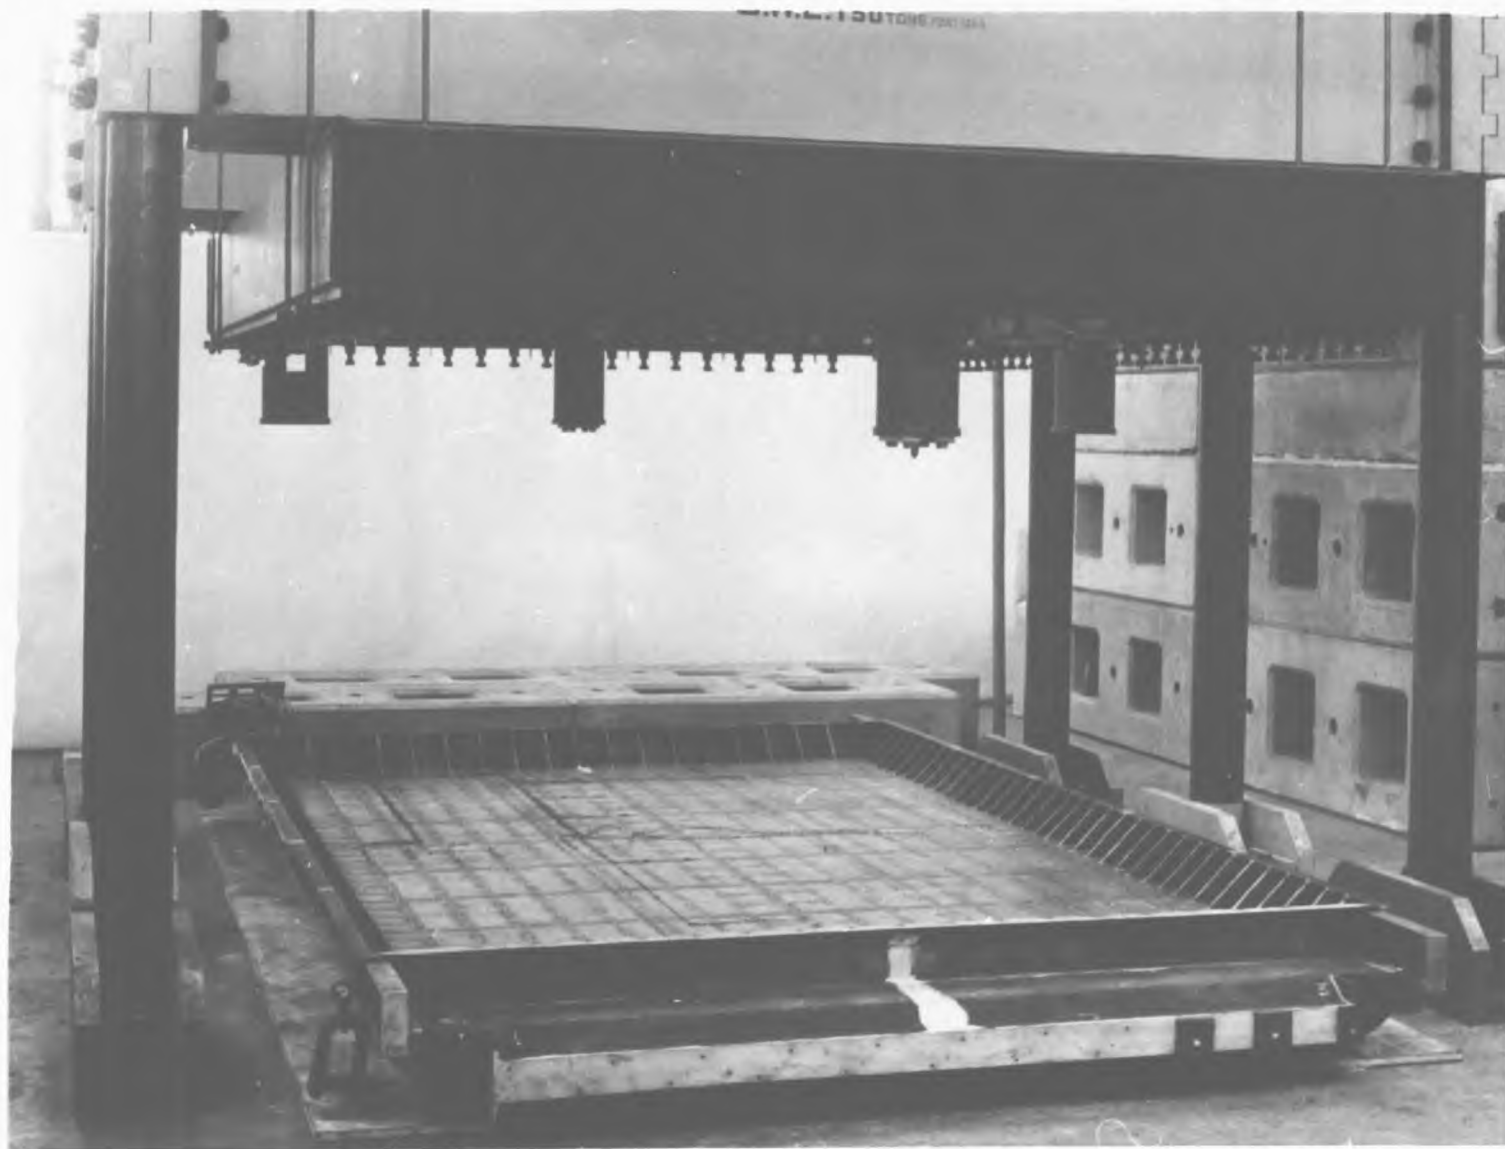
Model in Position Prior to Lowering Loading Frame Beams
